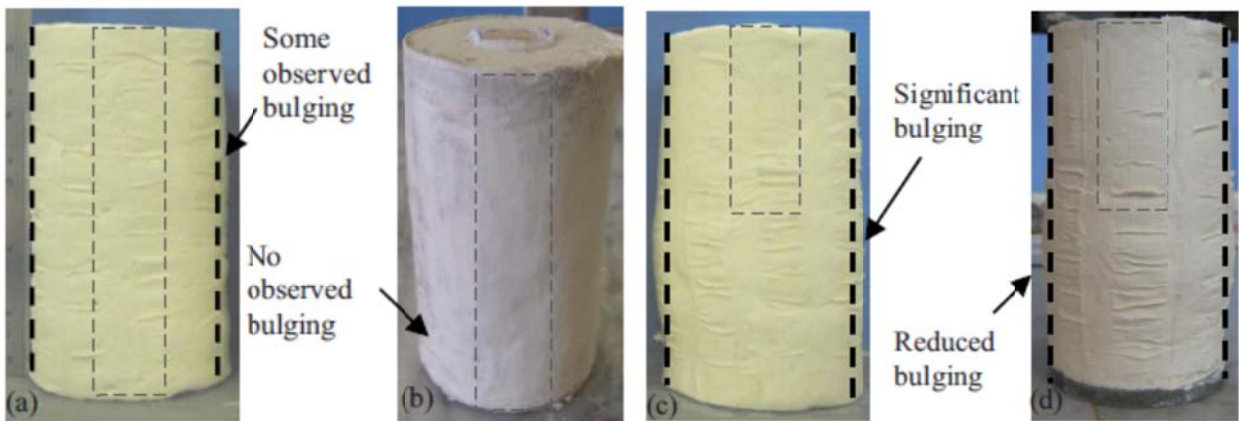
Modes of failure of clay specimens with (a) fully penetrating unreinforced column; (b) fully penetrating reinforced column; (c) unreinforced column with penetration ratio of 0.5; and (d) reinforced column with penetration ratio of 0.5
